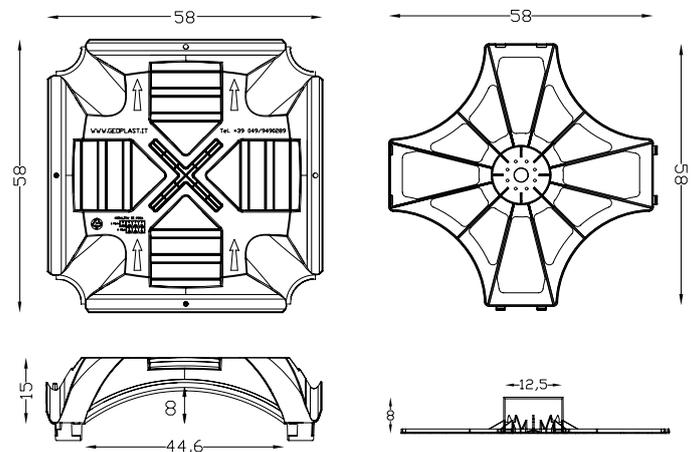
Shaft and base of the dimensional drawings NEW ELEVATOR
